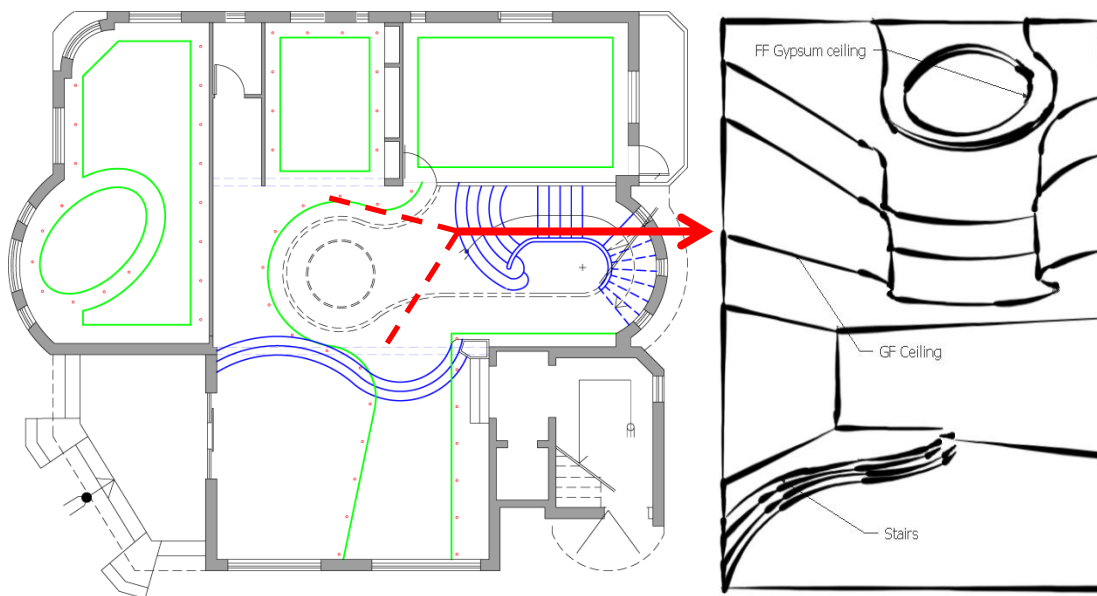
Ceiling Plan of the ground floor of Al-Rodaisy home with illustrating perspective
